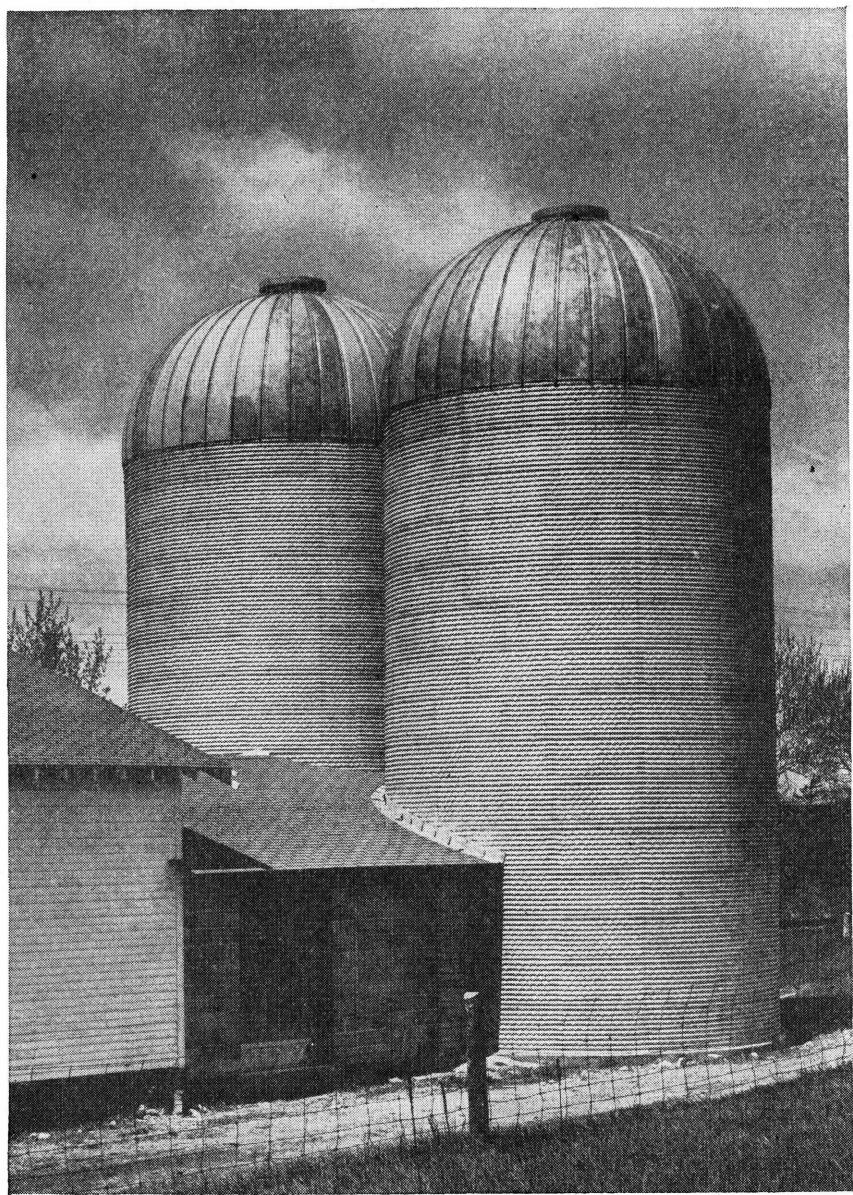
Large round cribs with perforated walls and central air ducts for forced ventilation.
